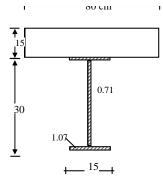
Beam Cross Section (Typical of Commercial Building)
